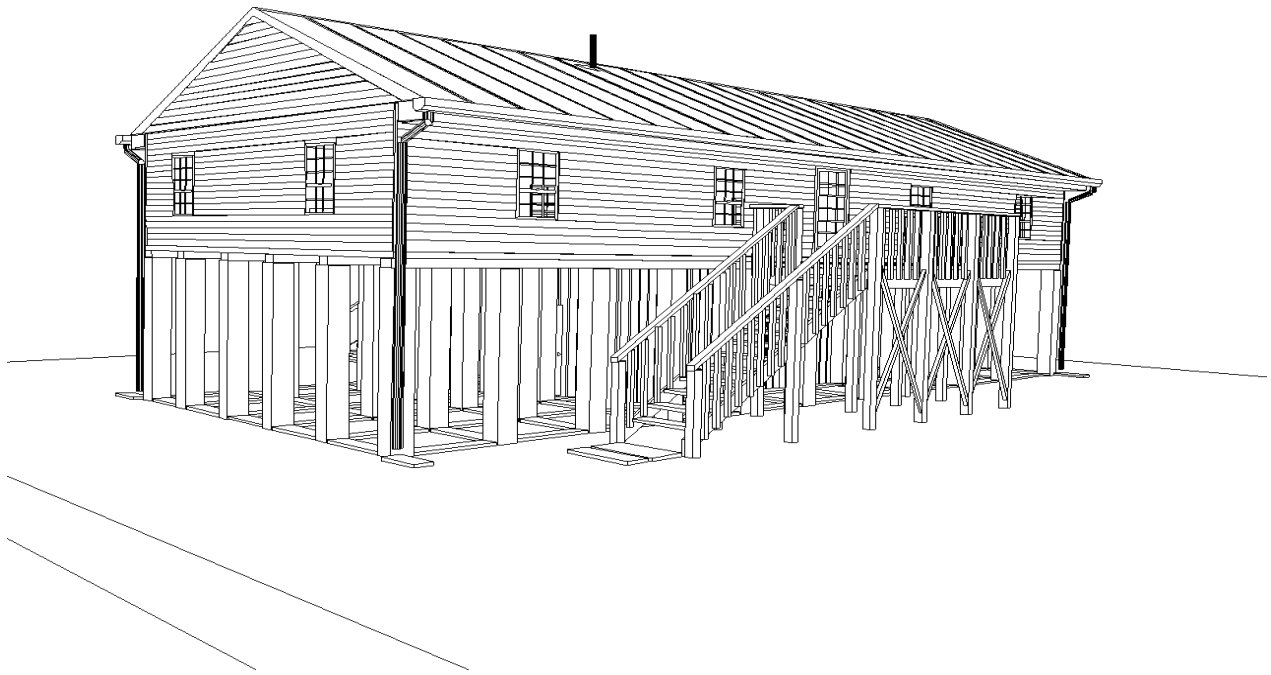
and 43 – Floodproofing Design – New Structure Wood Piling
